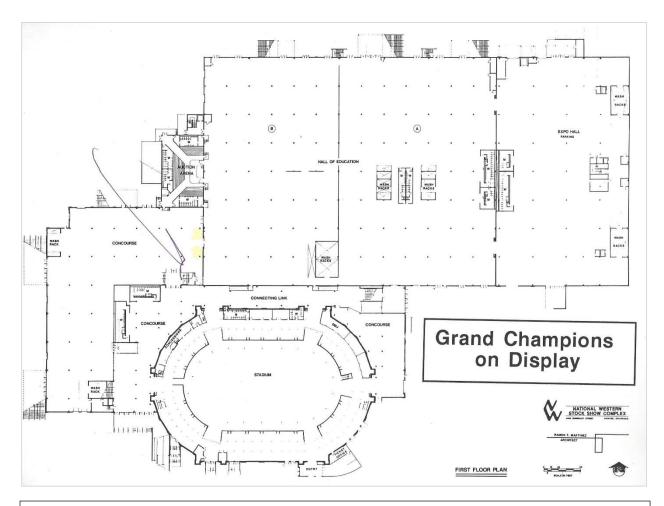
Plan drawings of the Stadium Arena, Stadium Hall, Education Hall, and Exposition Hall. Courtesy of the NWC archives, February 9, 2016.
